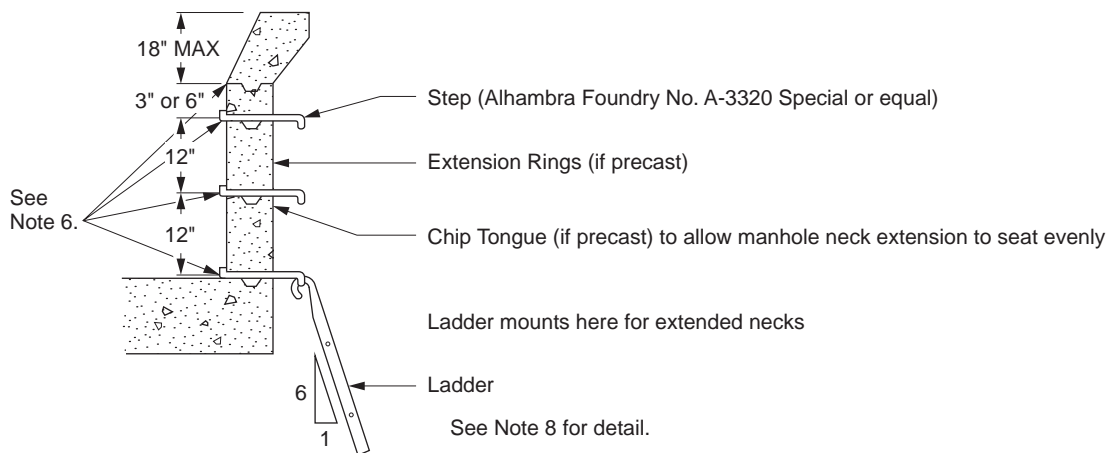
Typical Cross Section Step Installation for Extended Manhole Neck
